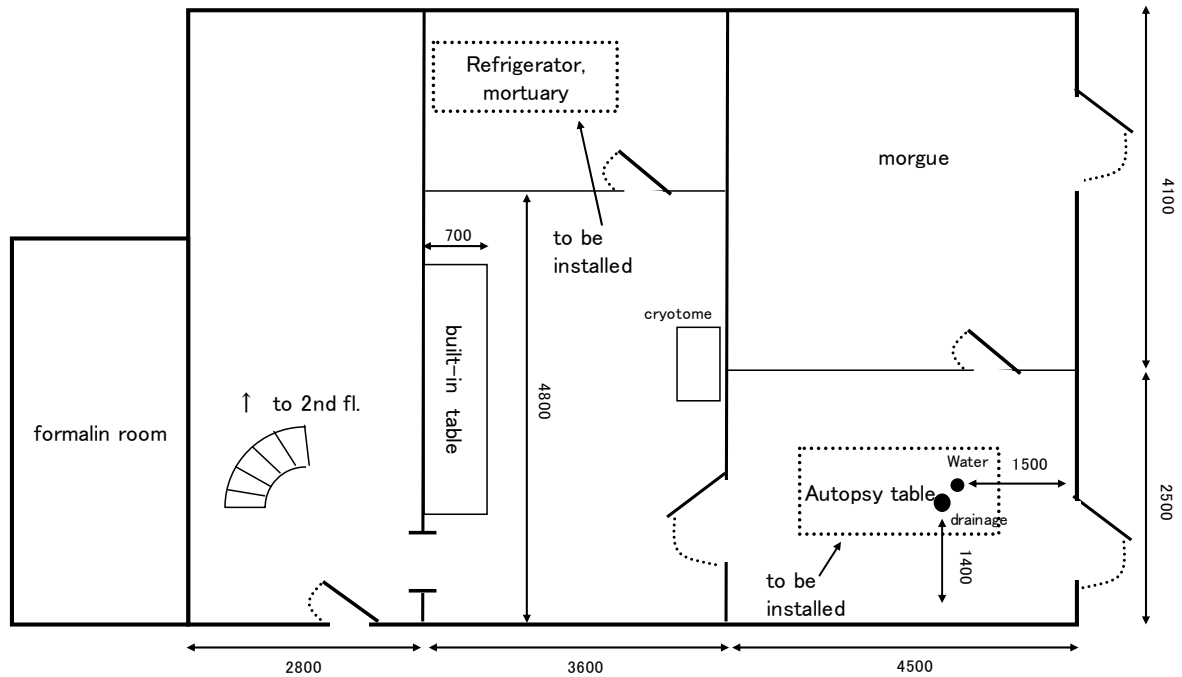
Layout plan of Autopsy table and Refrigerator, mortuary
